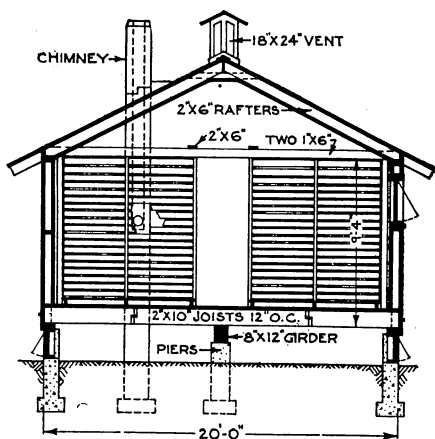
Section through a sweet-potato storage house, size 20 by 40 feet, having a capacity of 2,000 bushels in crates or 2,500 bushels in bulk, showing structural details
